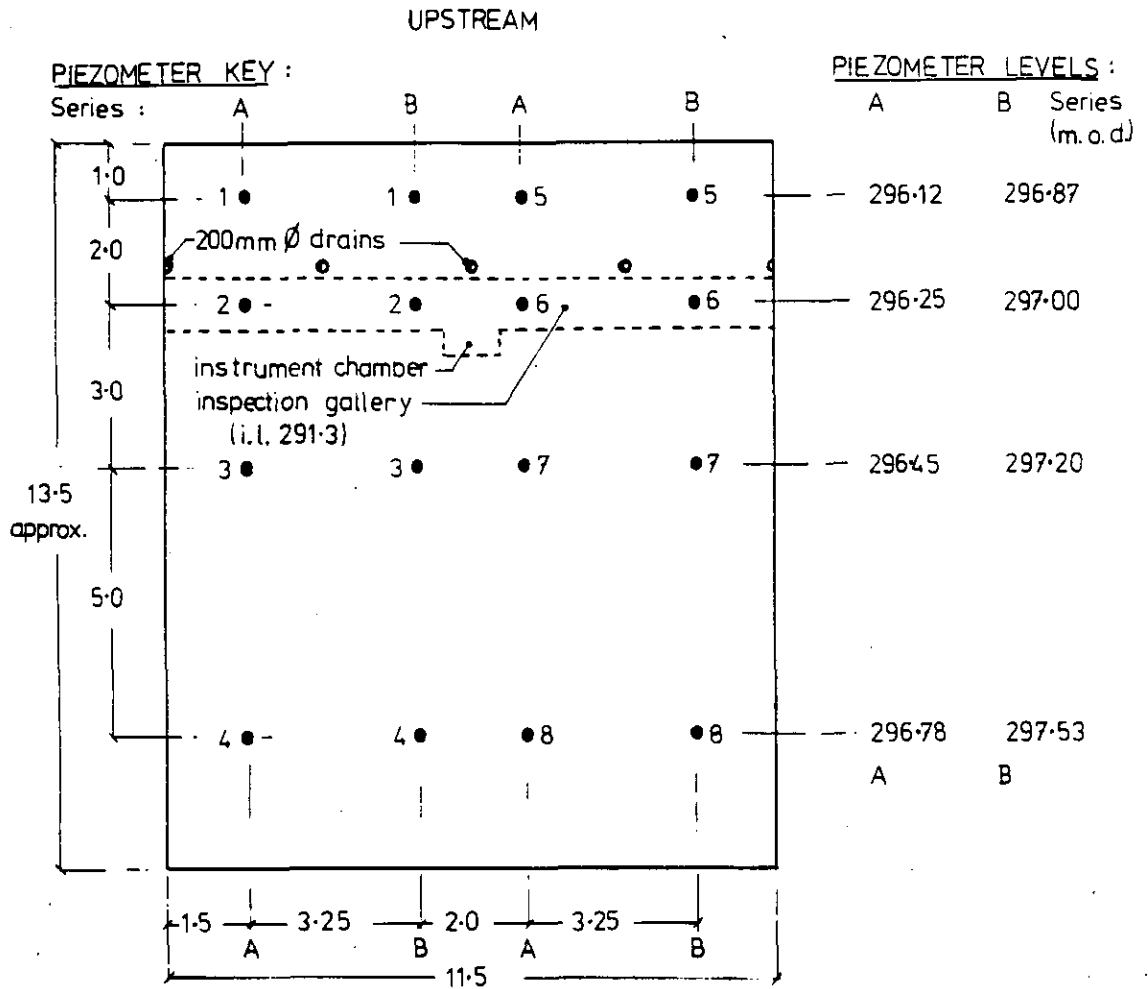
Details of CIRA Piezometer as Installed in Bradan Dam
